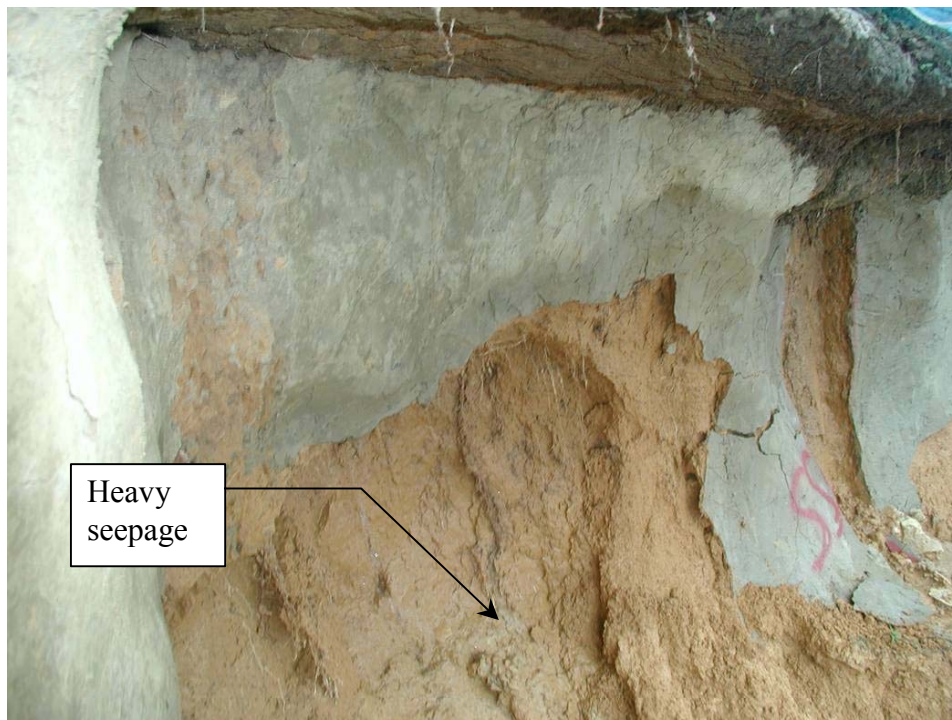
Heavy Seepage from Soil below Cement Mortar Cover during a Rainstorm
